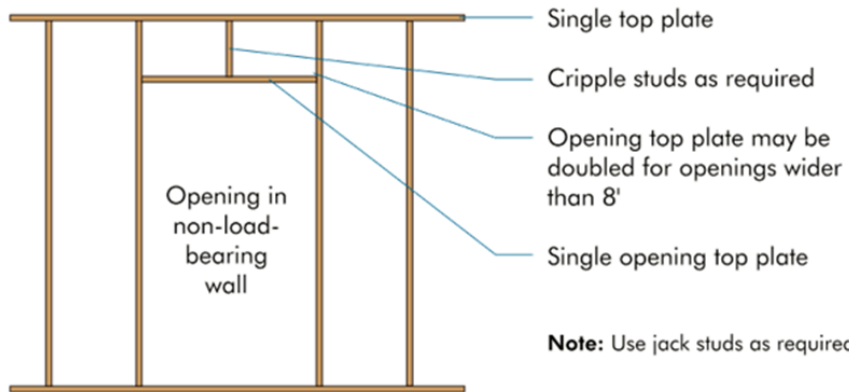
Framing around openings in non-load-bearing walls (adapted from Advanced framing construction guide, 2014)
